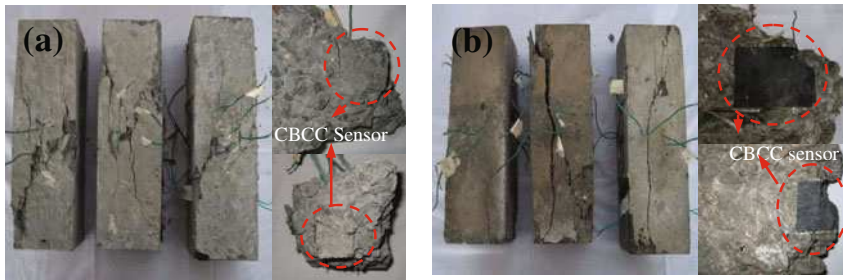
Failure modes of the embedded CBCC sensors (a) in C40 concrete column and (b) in C80 concrete column.
